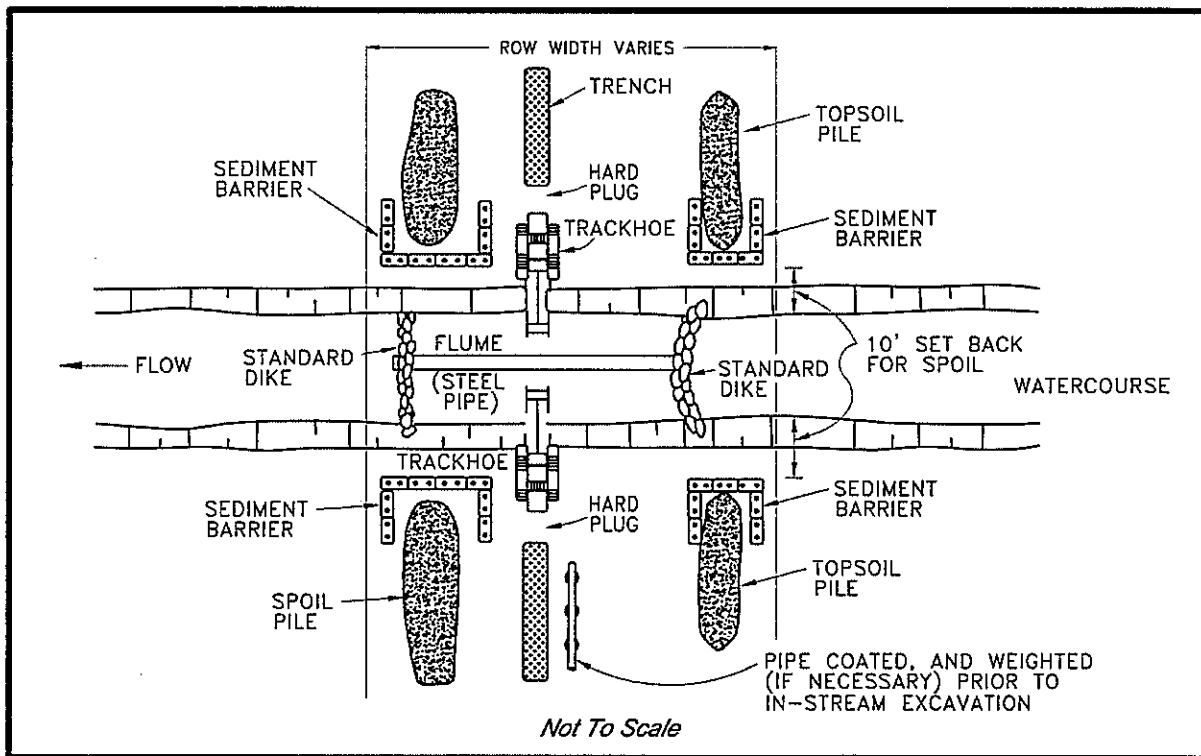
Typical Double Dike with Diversion Pipe Drainage Crossing Method.
